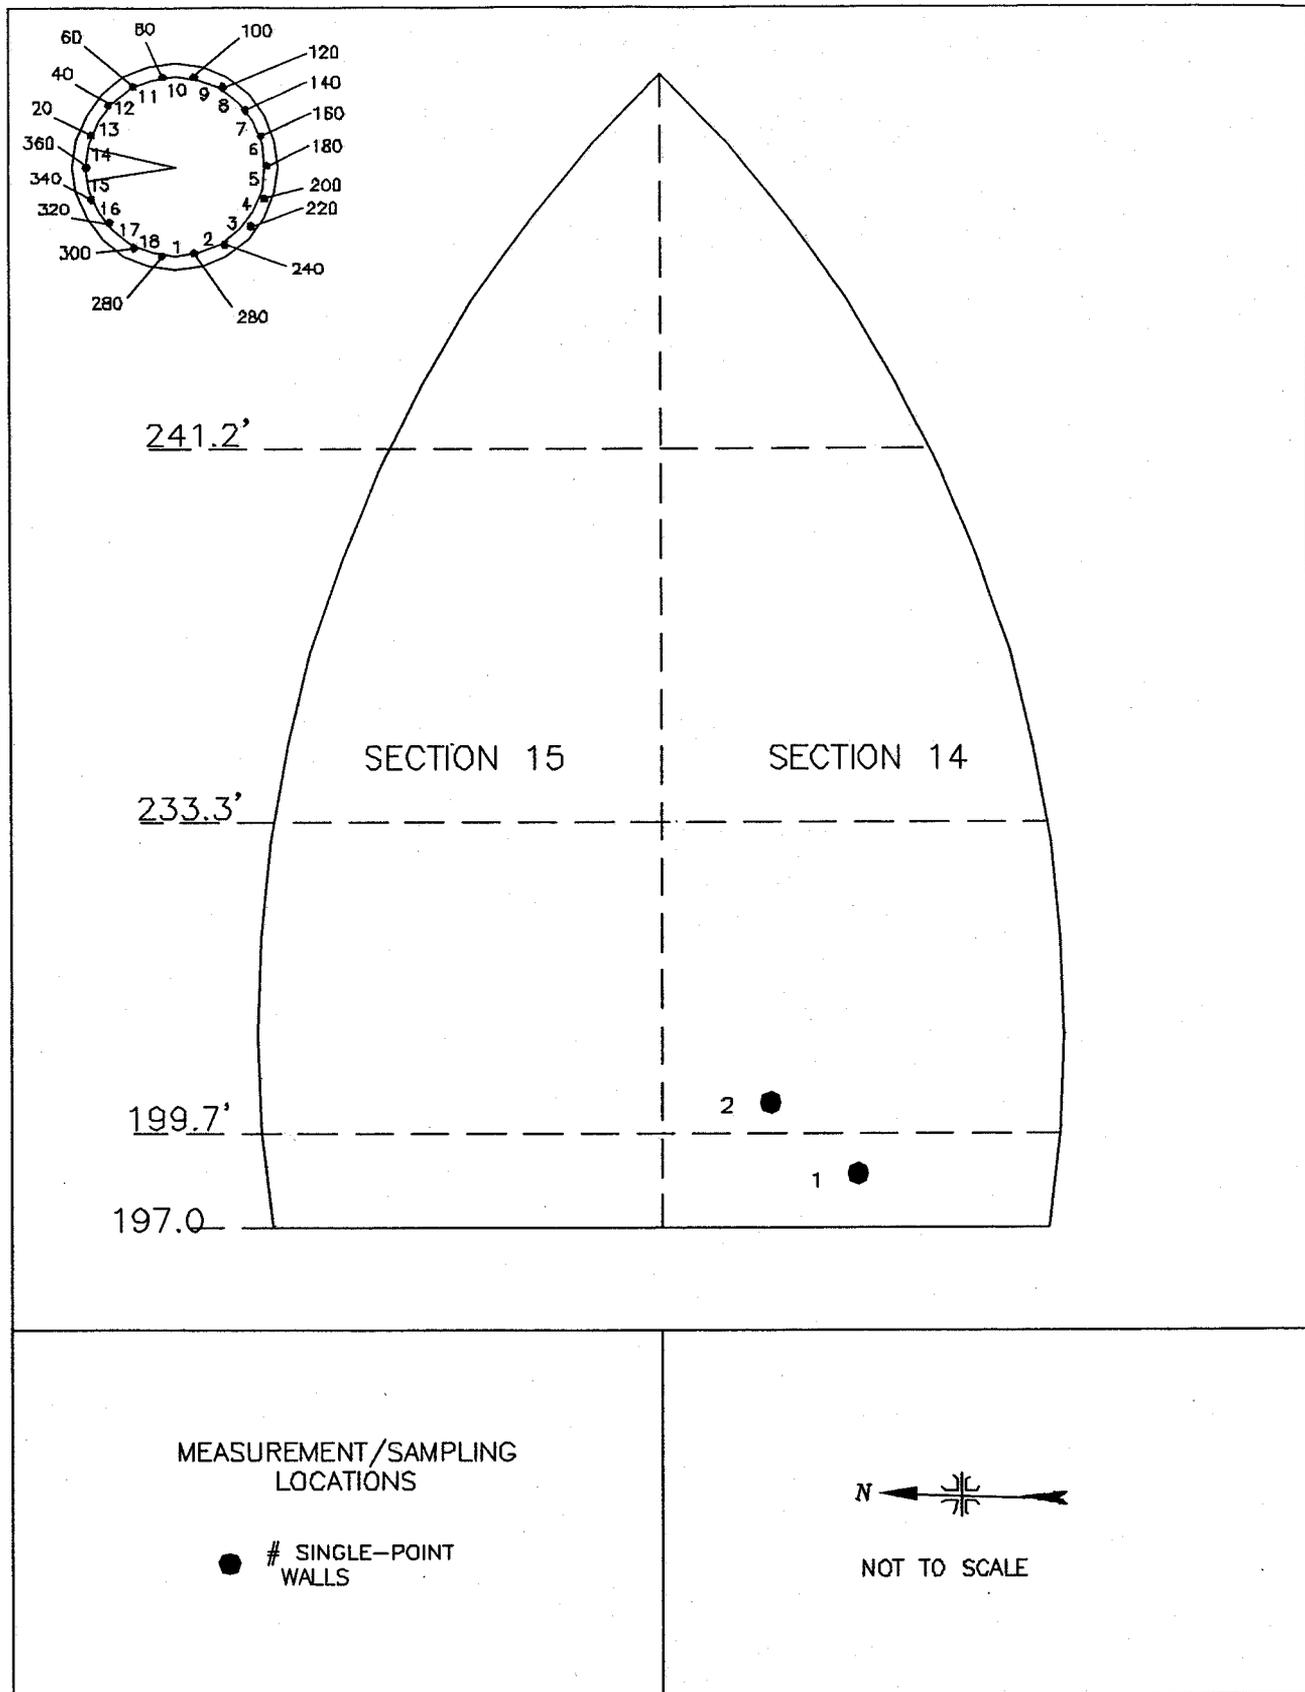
Containment Building Dome, Sections 14 and 15 - Measurement and Sampling Locations
